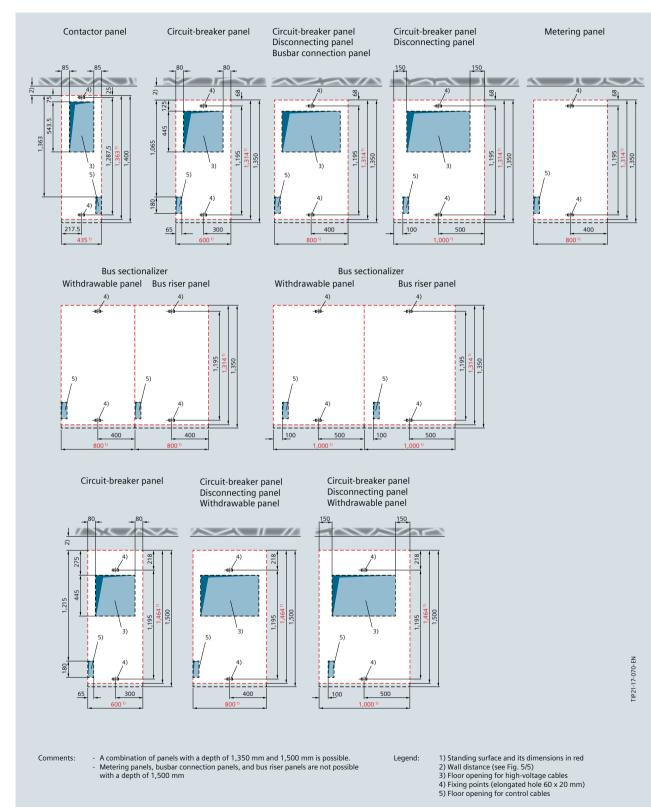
/7: Layouts, floor openings, and fixing points for NXAIR with Ur up to 17.5 kV, Isc up to 31.5 kA, Ir up to 2,500 A (dimensions in mm)
